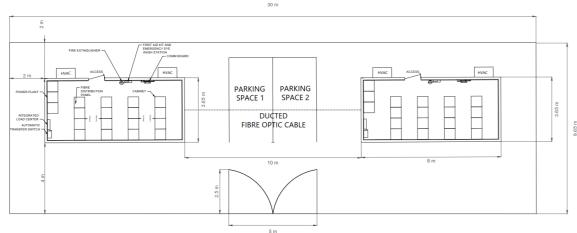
Indicative Telecommunications Building drawing (not to scale). EN020022-000466-2.9 Indicative Telecommunications Building(s) Elevations and Floor Plans [REP1-020].
